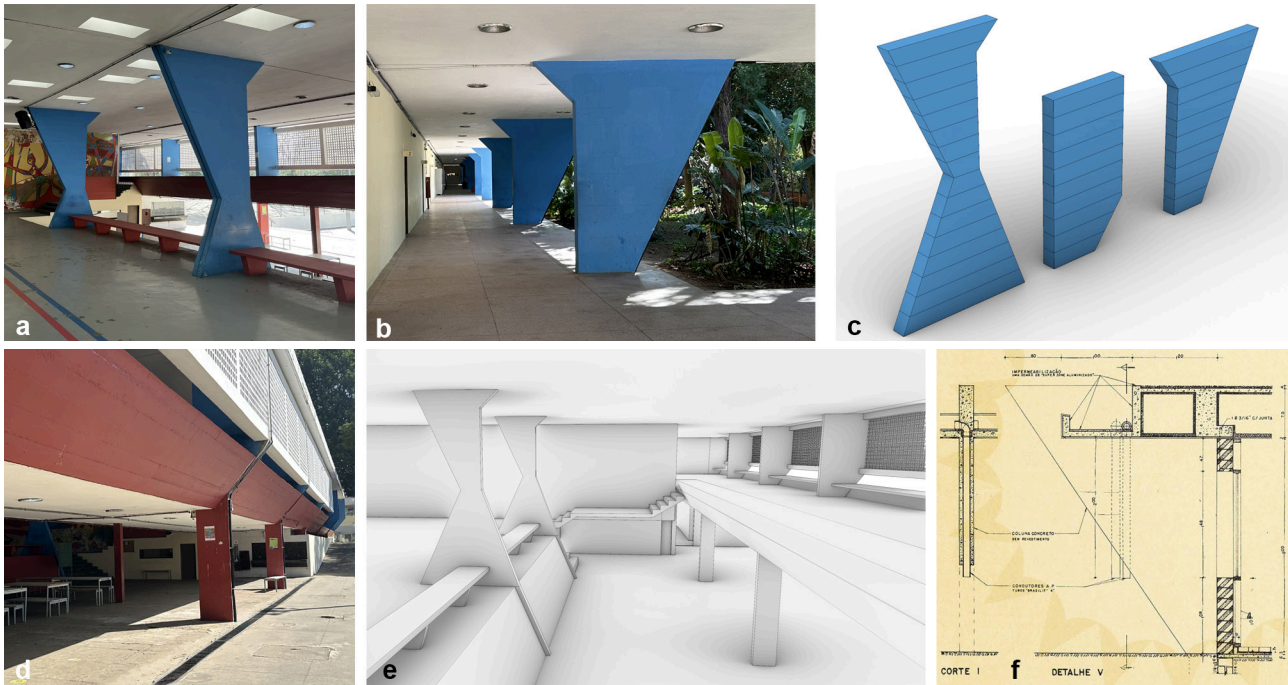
a., b., d.: Photos of Guarulhos Gymnasium (photos by the authors); c. three types of columns (model by the authors); e. 3D rendering of the interior of the building (elaboration by the authors); f. constructive drawing (source: Acrópole 1961, no. 274).
